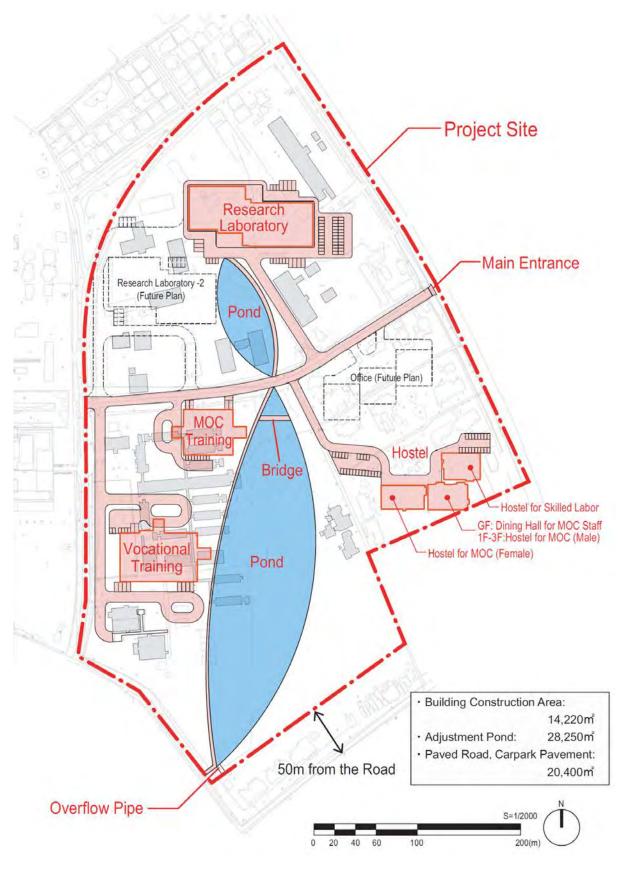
Building Layout Plan of the Thuwunna RLTC
